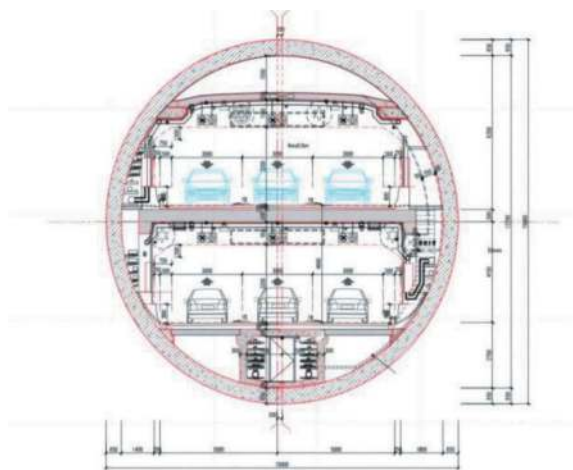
Cross-sectional structure of Caobao Road Tunnel.
